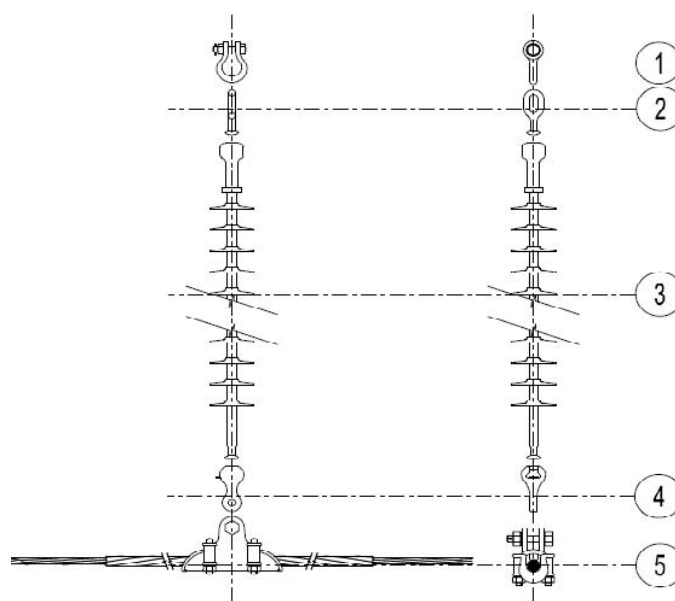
Phase Conductor Single “I-String A” Suspension Assembly for Single “Conductor”
